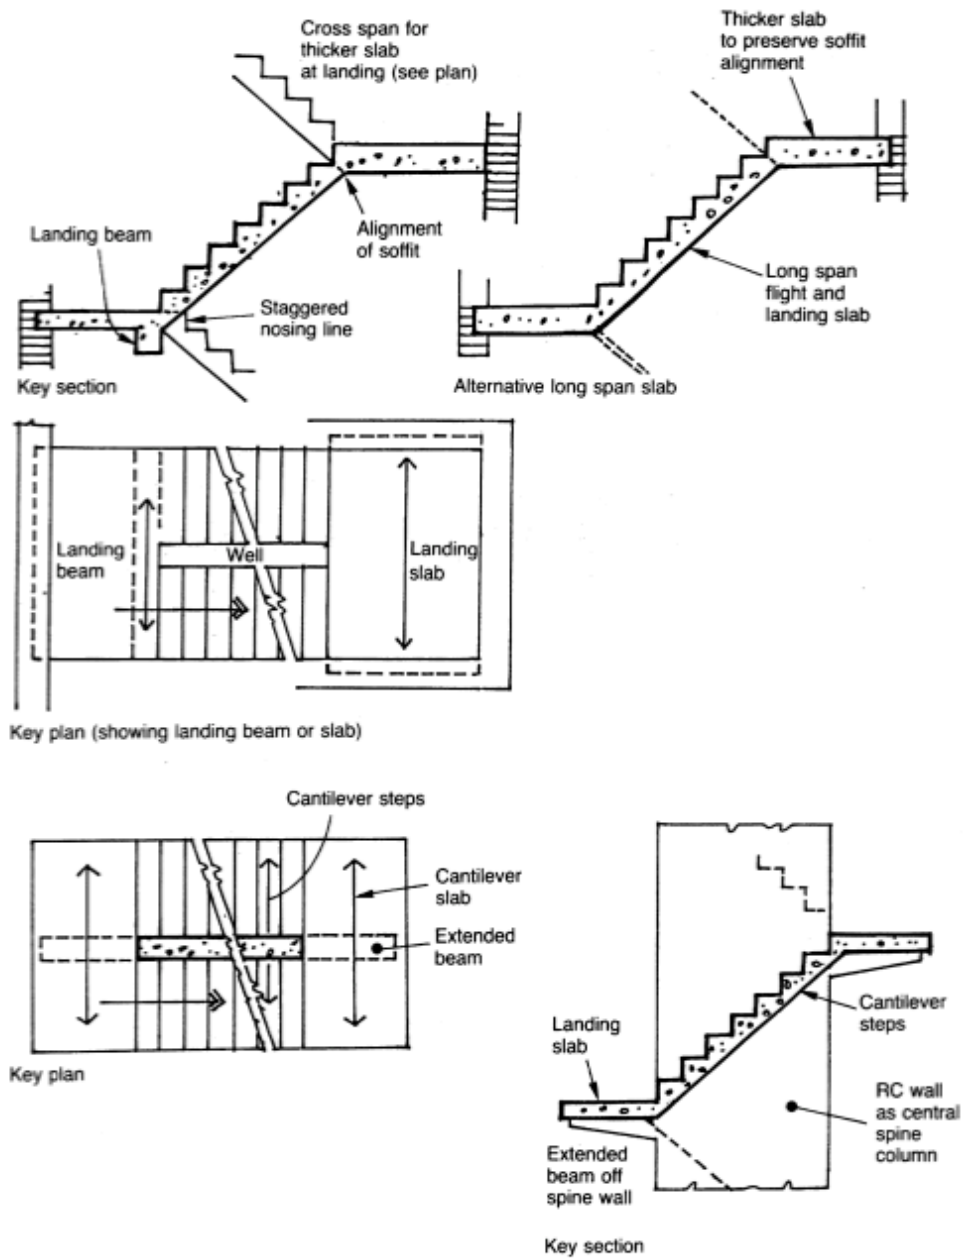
Developed forms of reinforced concrete stair: Simple RC slabs (with and without landing beams)
